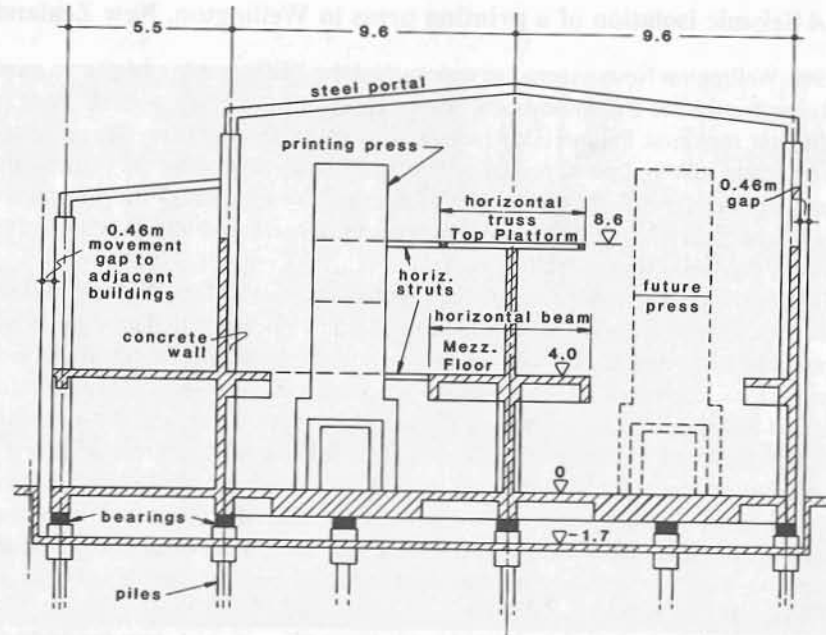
End elevation of Press Hall for Wellington Newspapers, Petone
